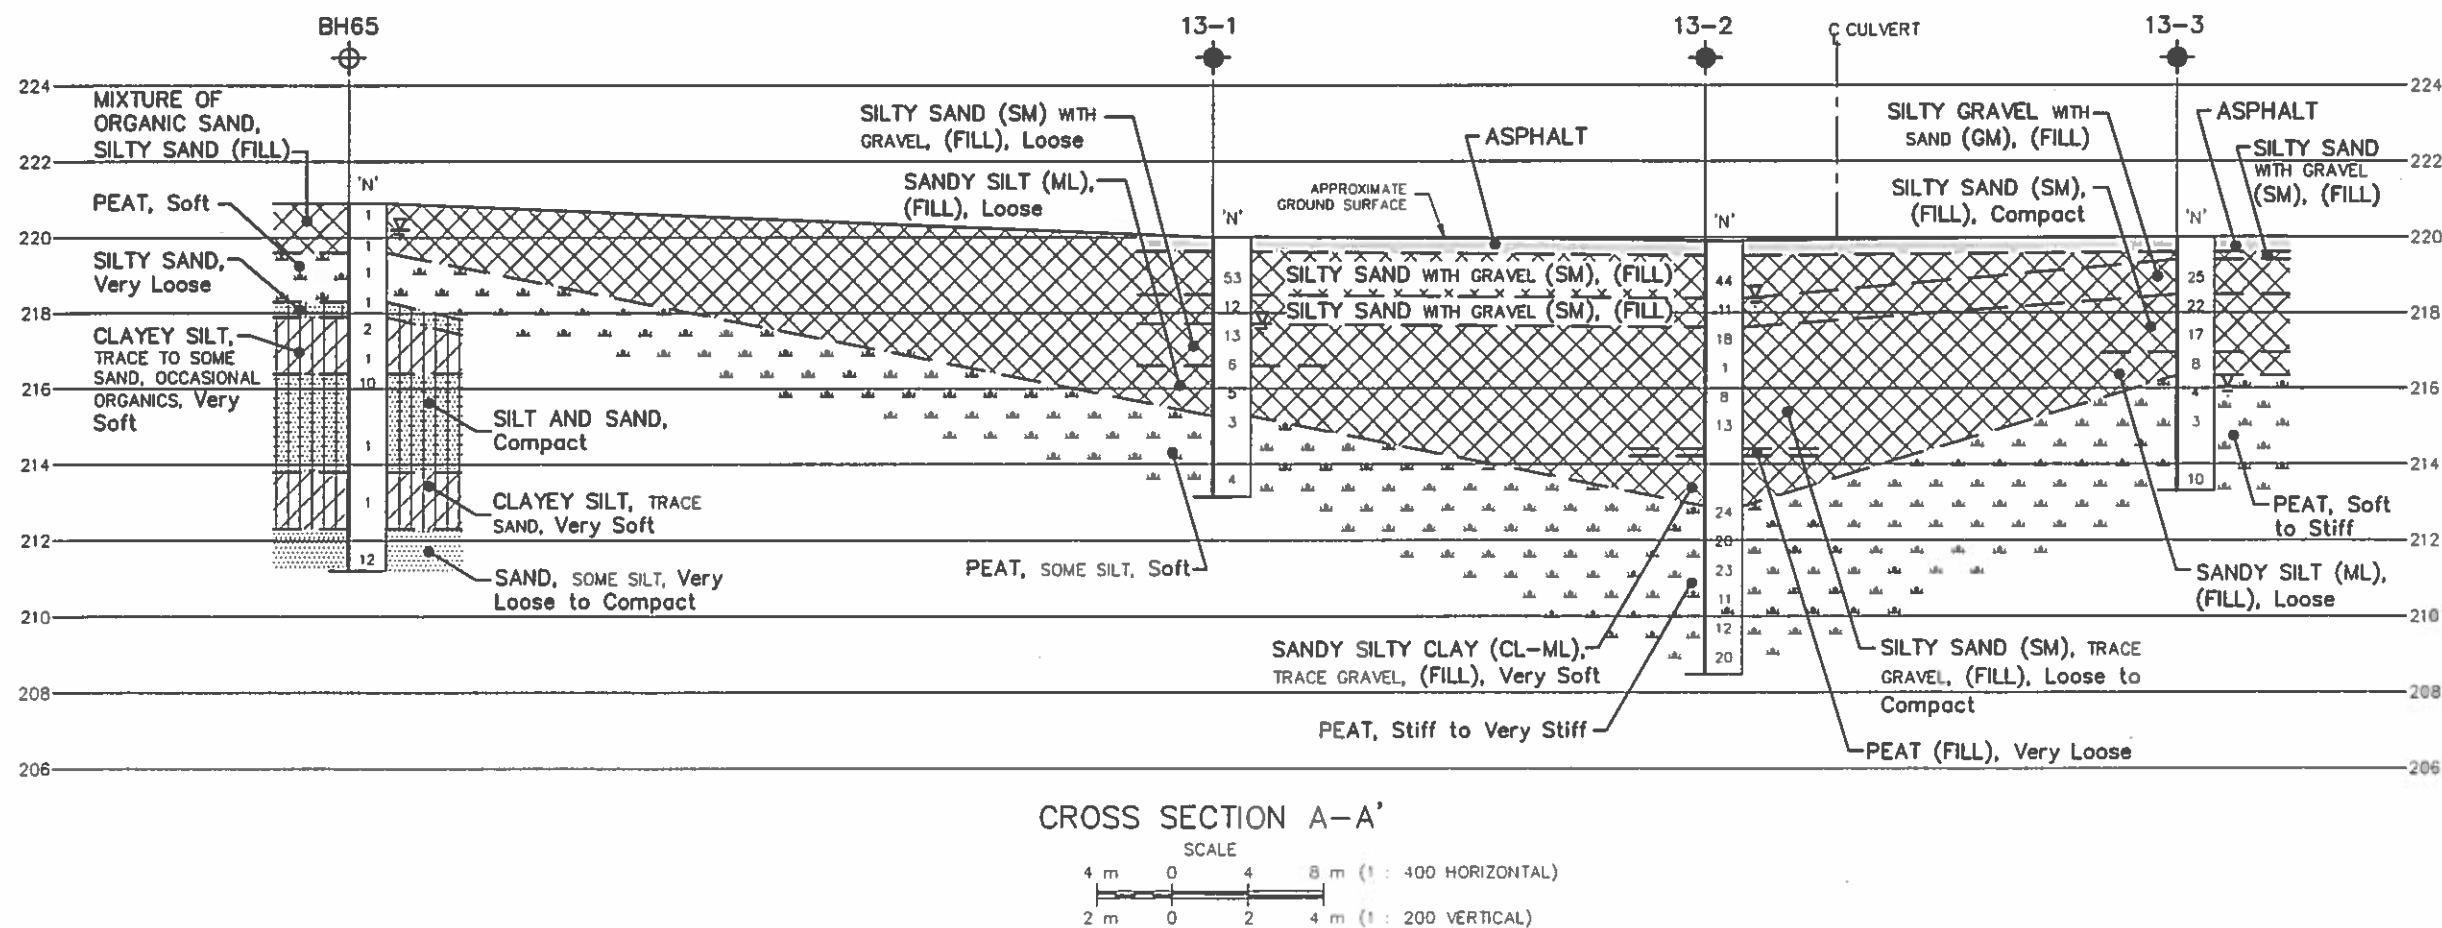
Borehole Location Plan and Soil Strata Plot
